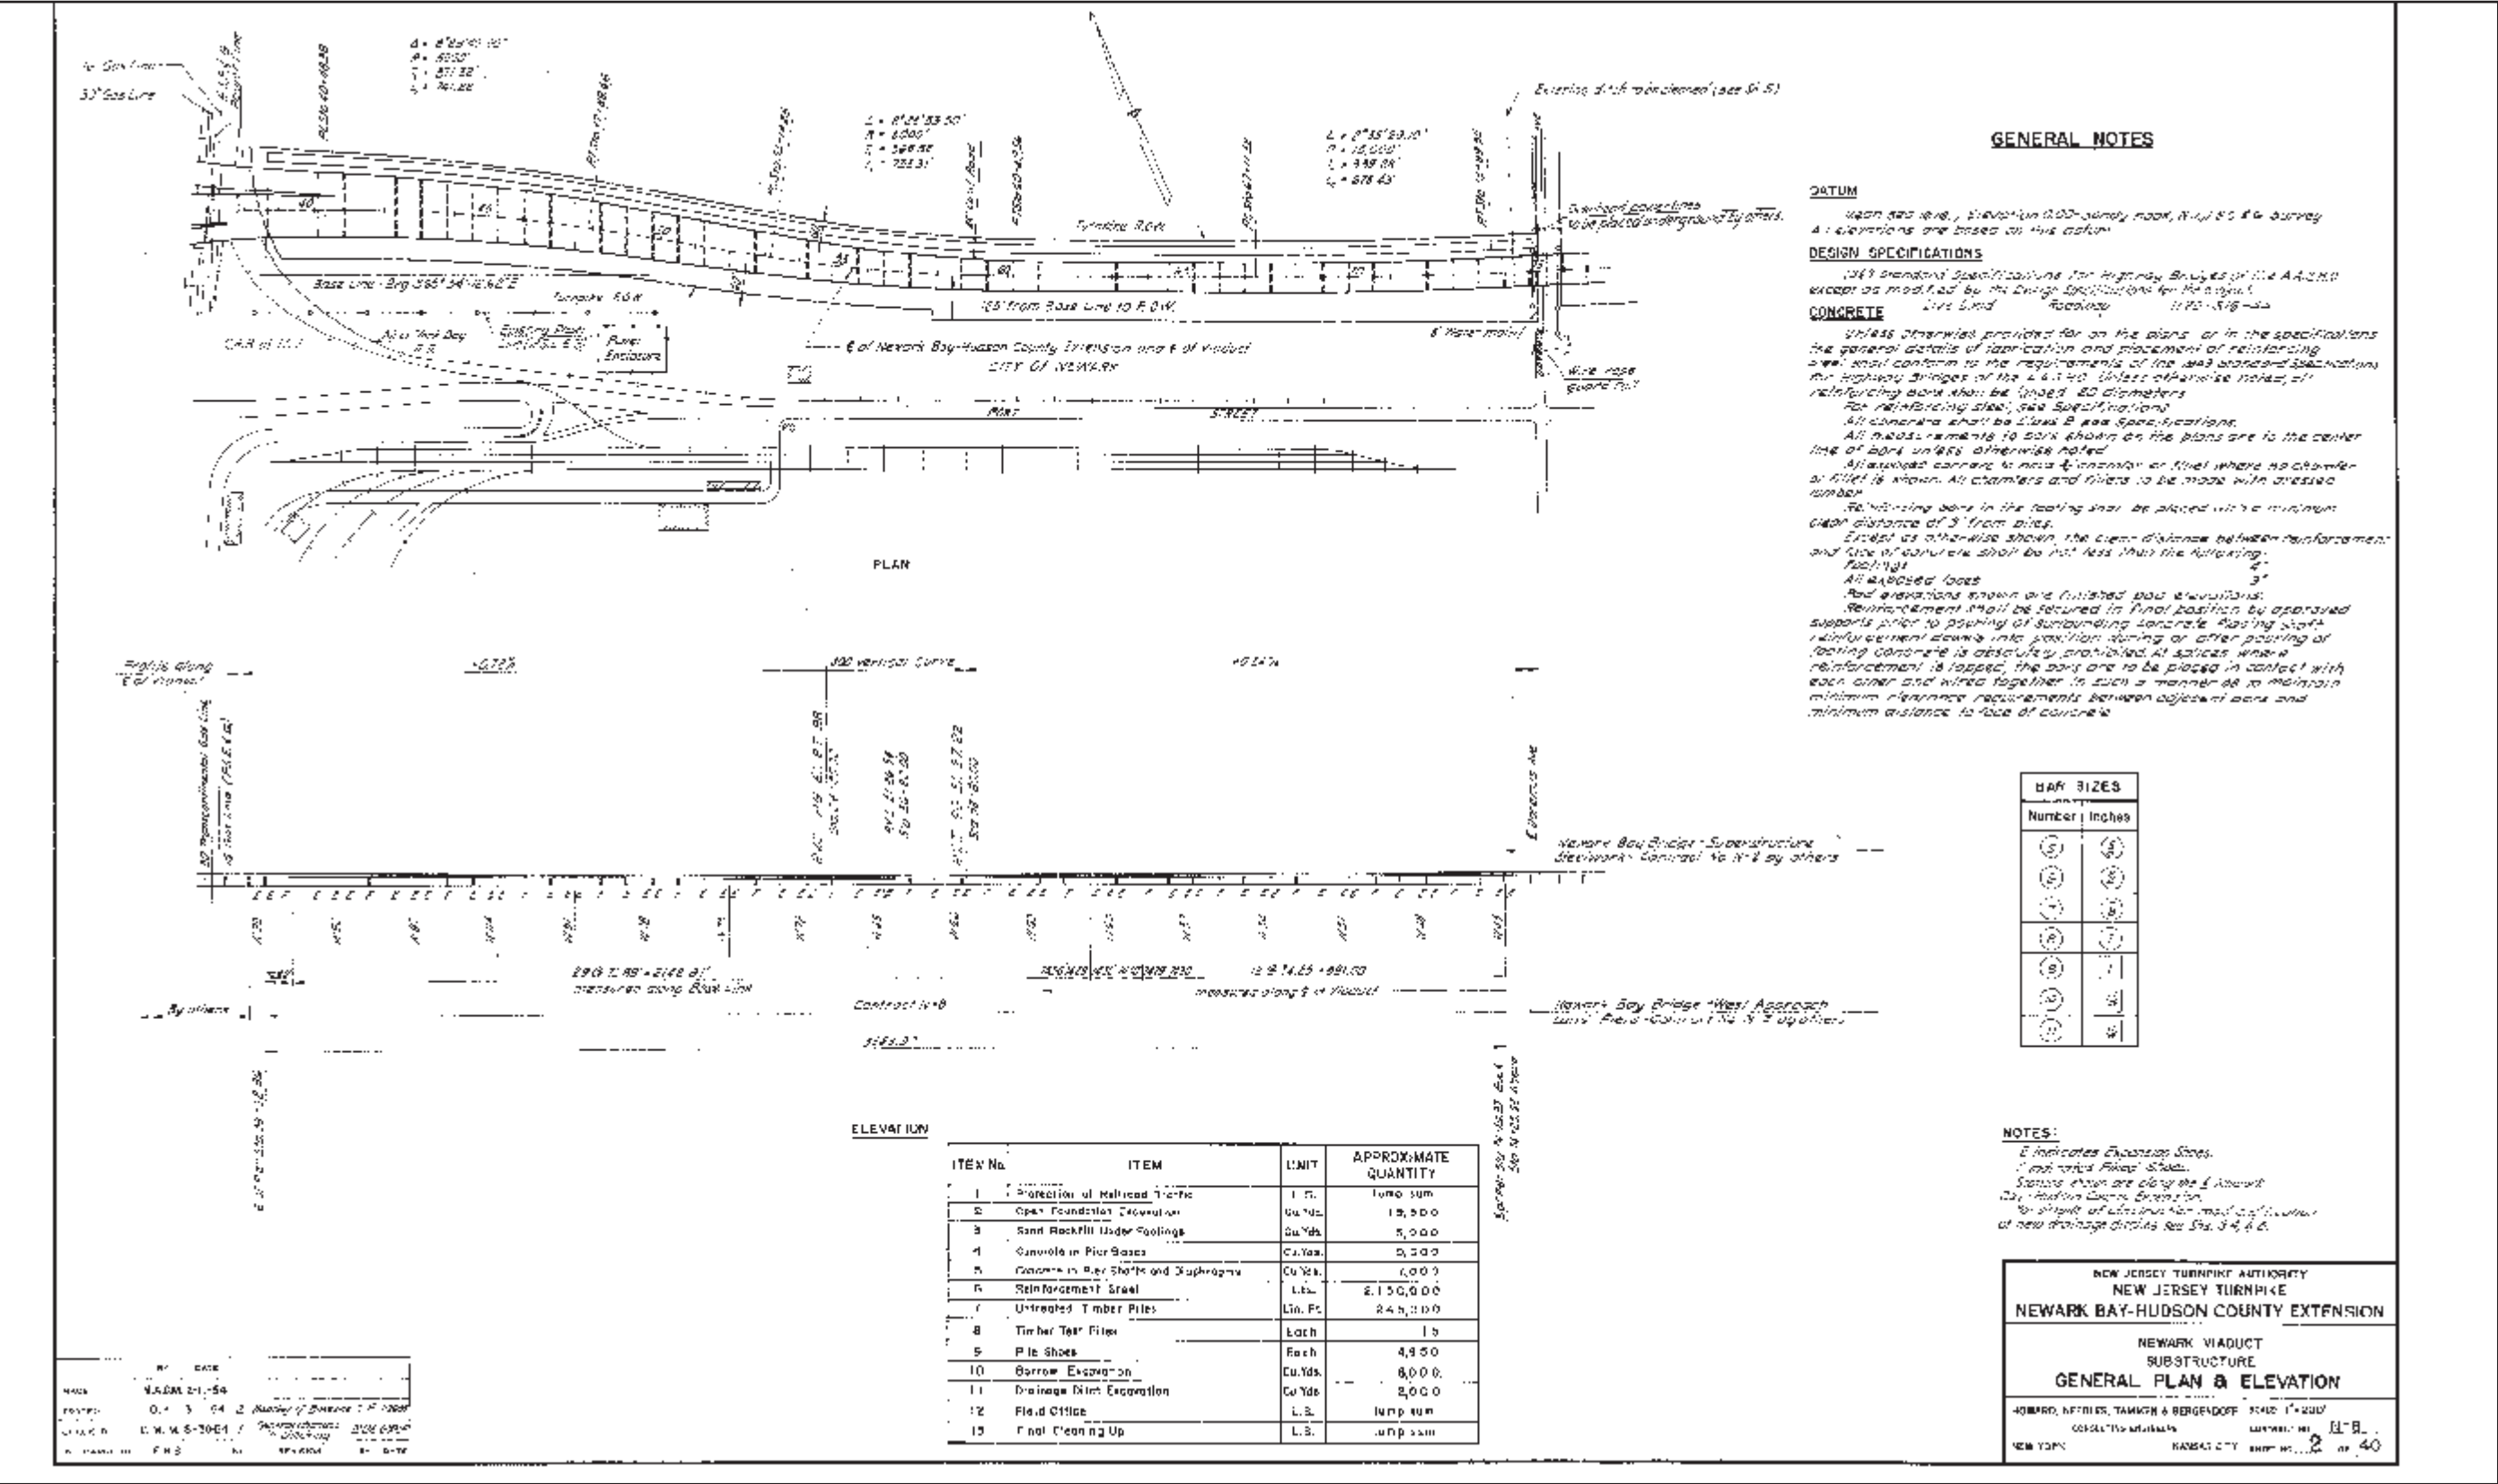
1955 construction drawing showing the general plan and elevation of the Newark Viaduct (HNTB 1955a).
